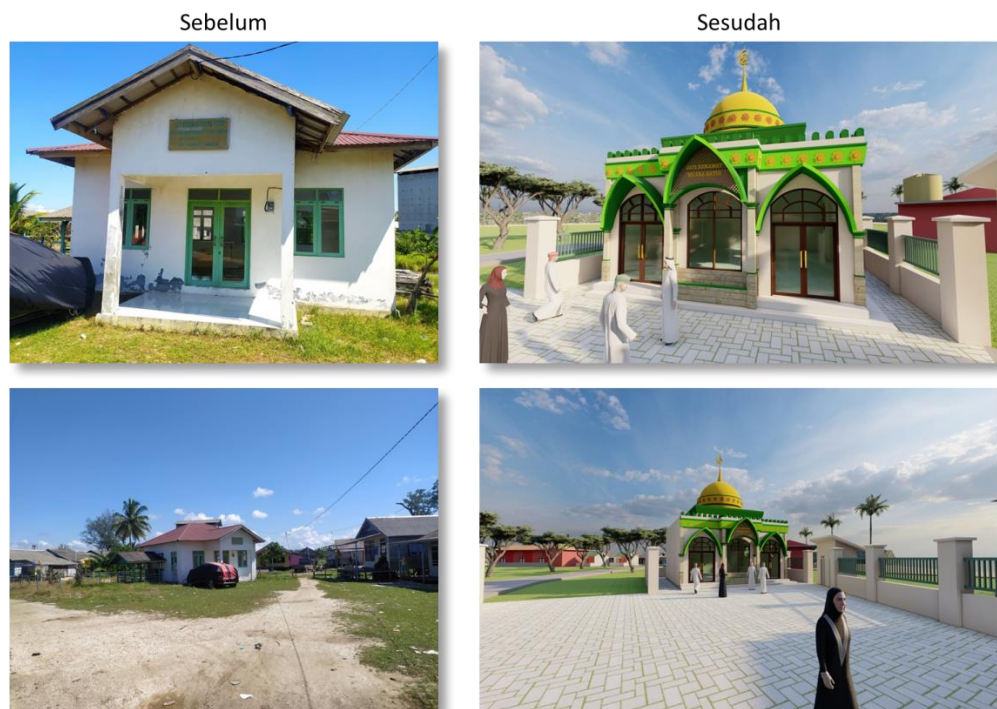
Arrangement of Makom Jati Keramat (Plan for Arrangement of Makom Jati Keramat Pilgrimage Tourism Area)
